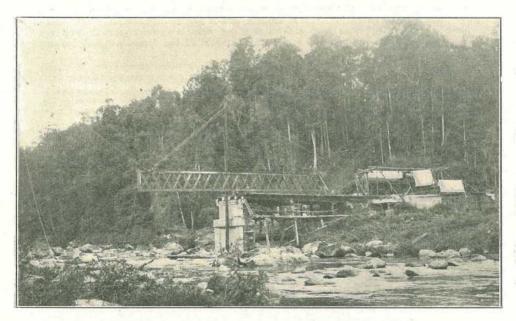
LAUNCHING THE FIRST GIRDER.
